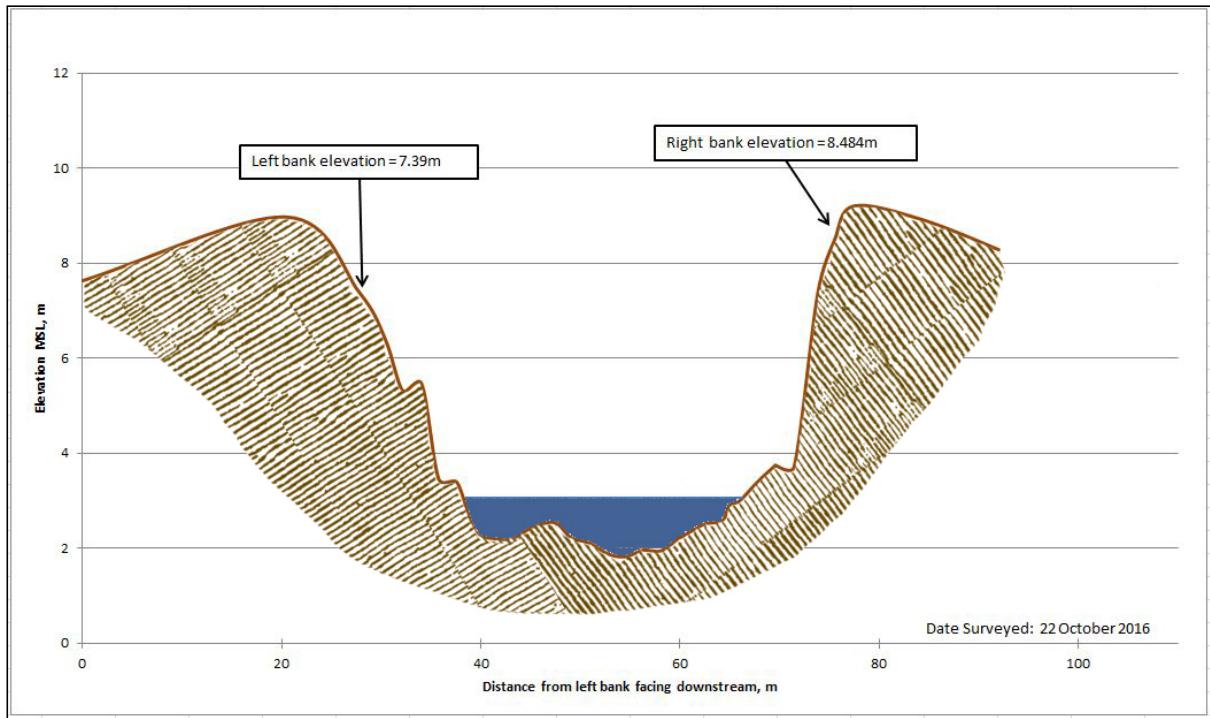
Cross-Section Plot of Sta. Elena Bridge
